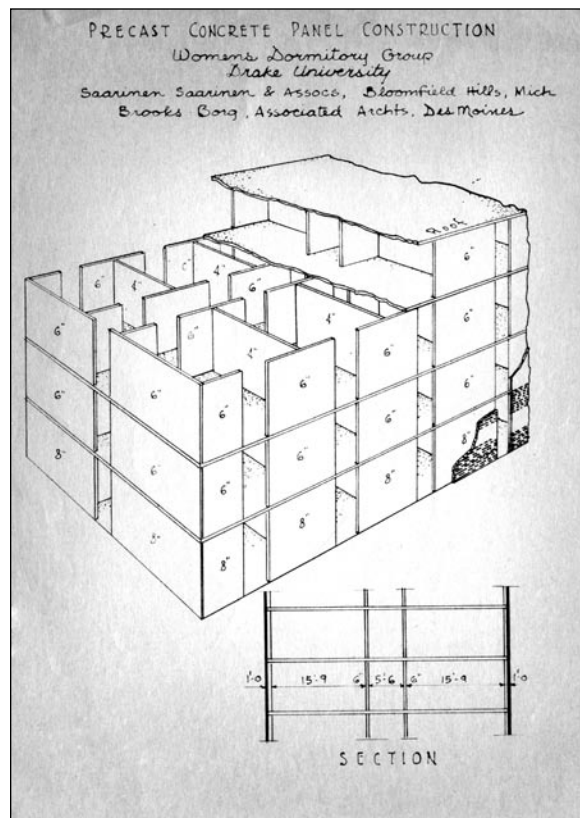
Women's Dormitory sketch, undated, Eero Saarinen and Associates and Brooks Borg, showing proposed precast concrete panel construction (Residence Halls Photo Files, Special Collections, Cowles Library, Drake University).
